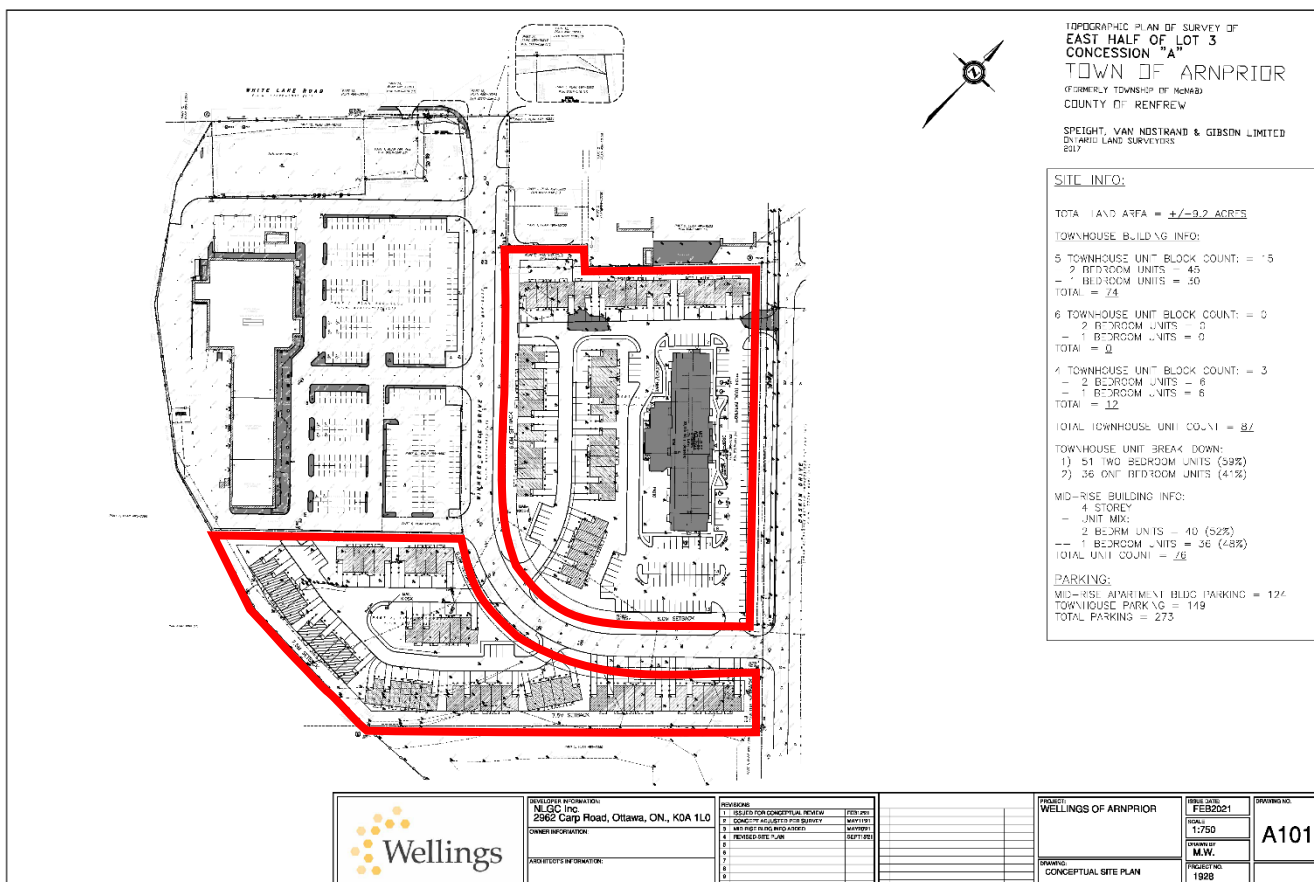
Concept Plan, subject lands shown in red (source: Wellings of Arnprior Inc.).
